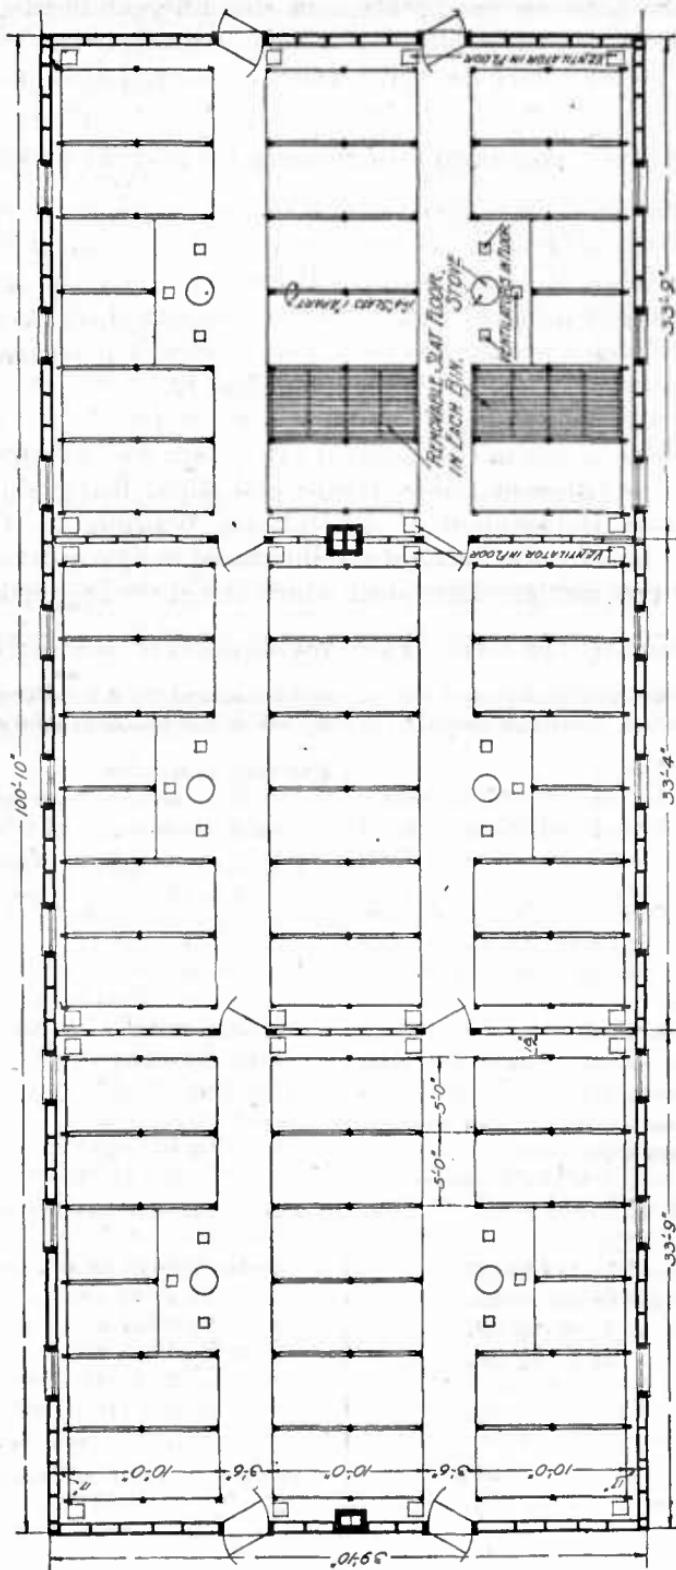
Floor plan of a 40 by 100 foot sweet-potato storage house having a capacity of 15,500 bushels.
